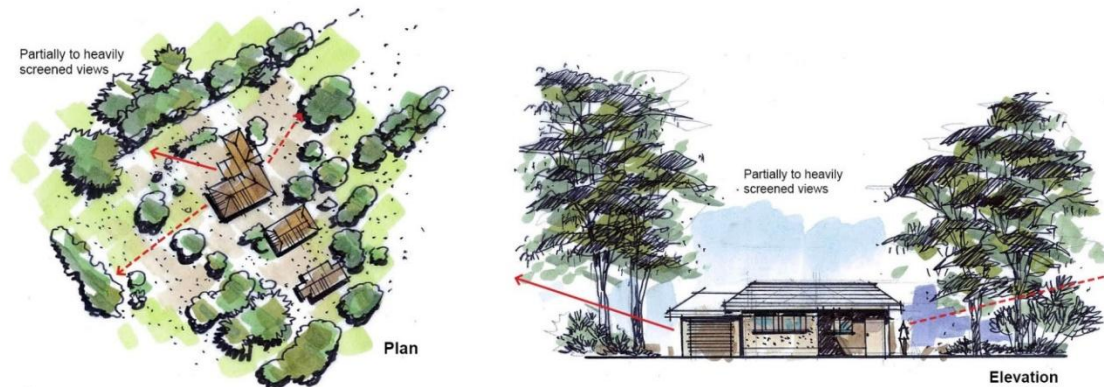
Typology 2 – Partially screened. Typical plan and elevation.
